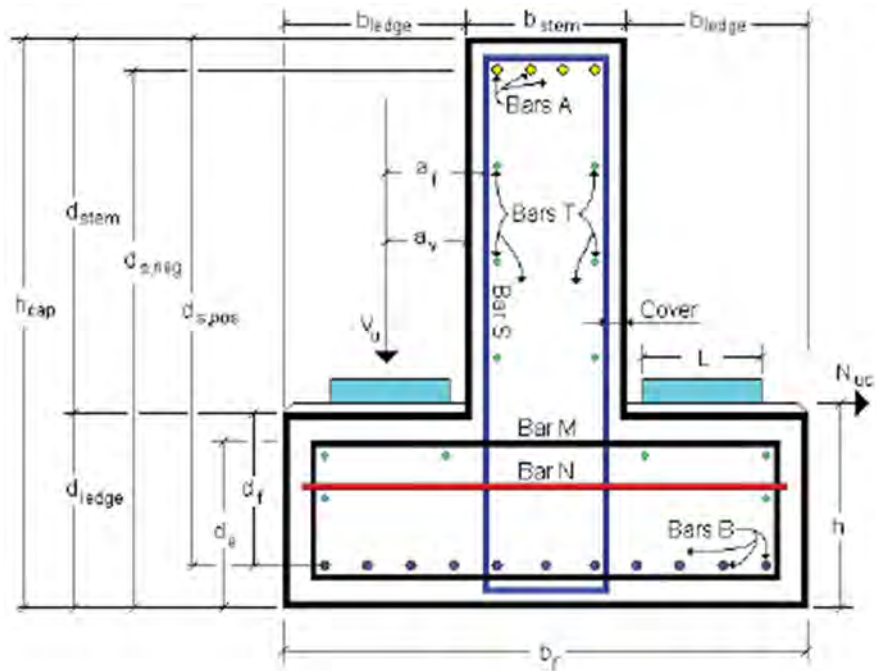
Section View of 30 Degrees Skewed ITBC
